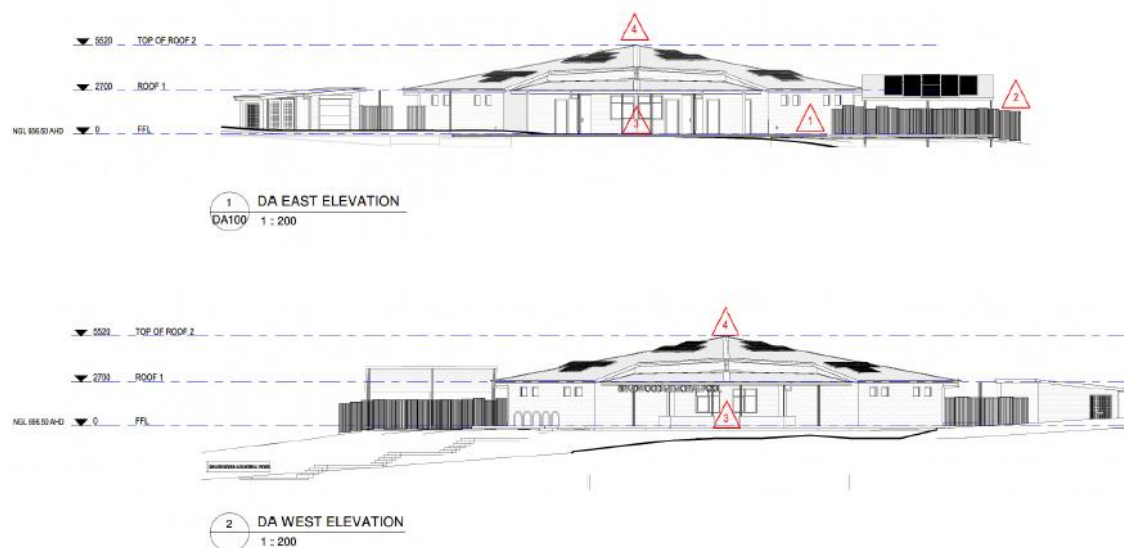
Proposed East and West External Elevations (Prepared by Paul Barnett Design Group)
